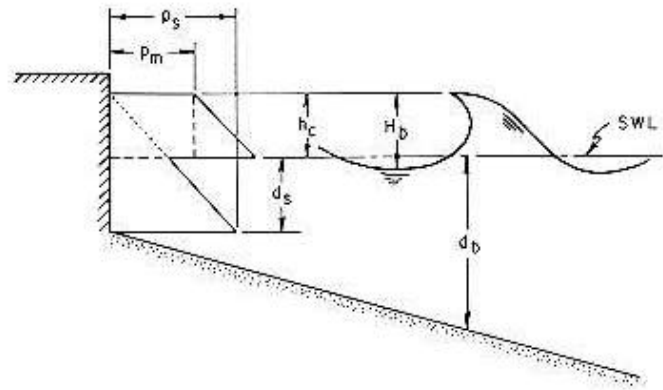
Wave Forces on Vertical Wall (USACE, SPM, 1984)
